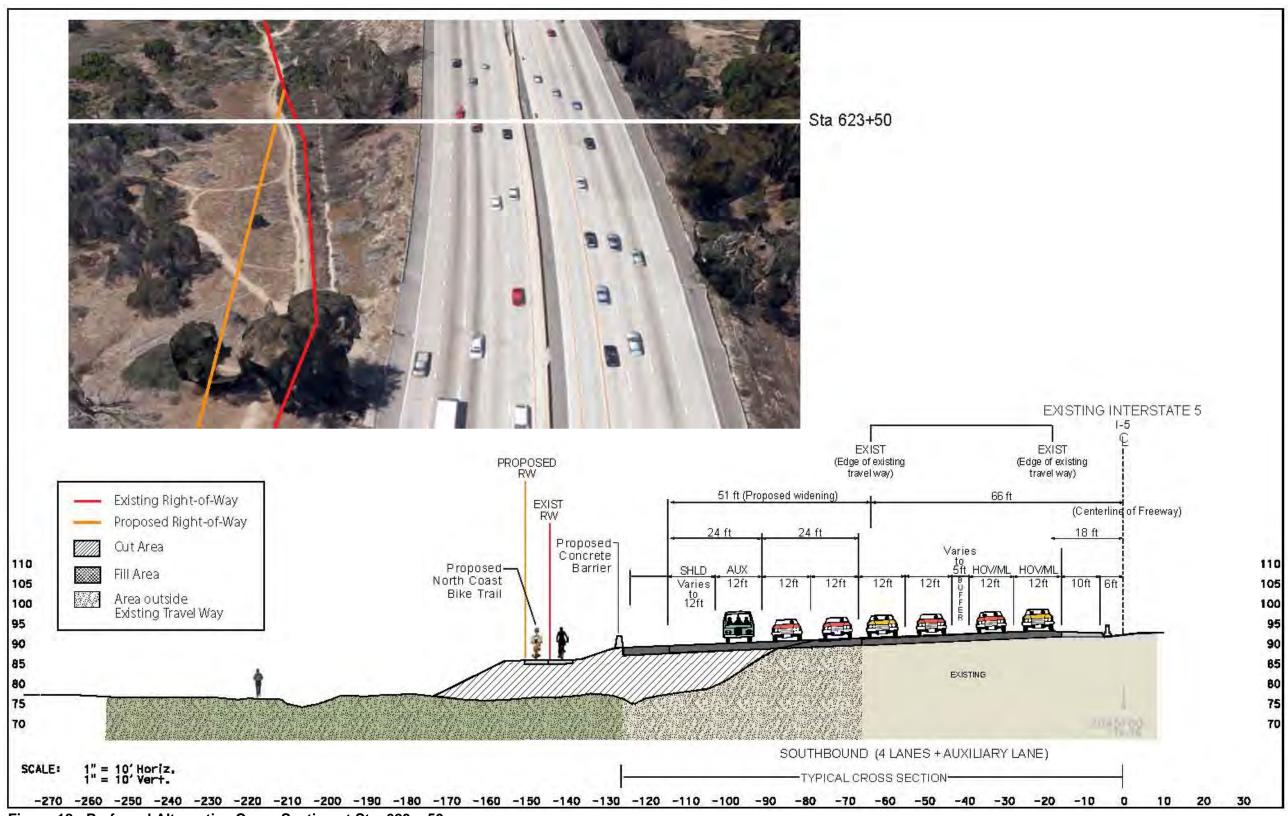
Preferred Alternative Cross Section at Sta. 623 + 50
